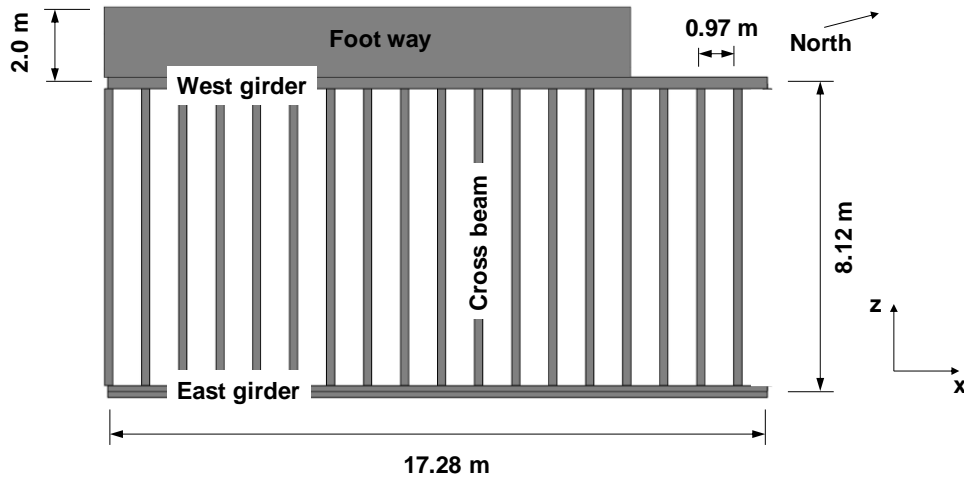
Plan schematic of the Bascule Bridge (lengths in metres).
